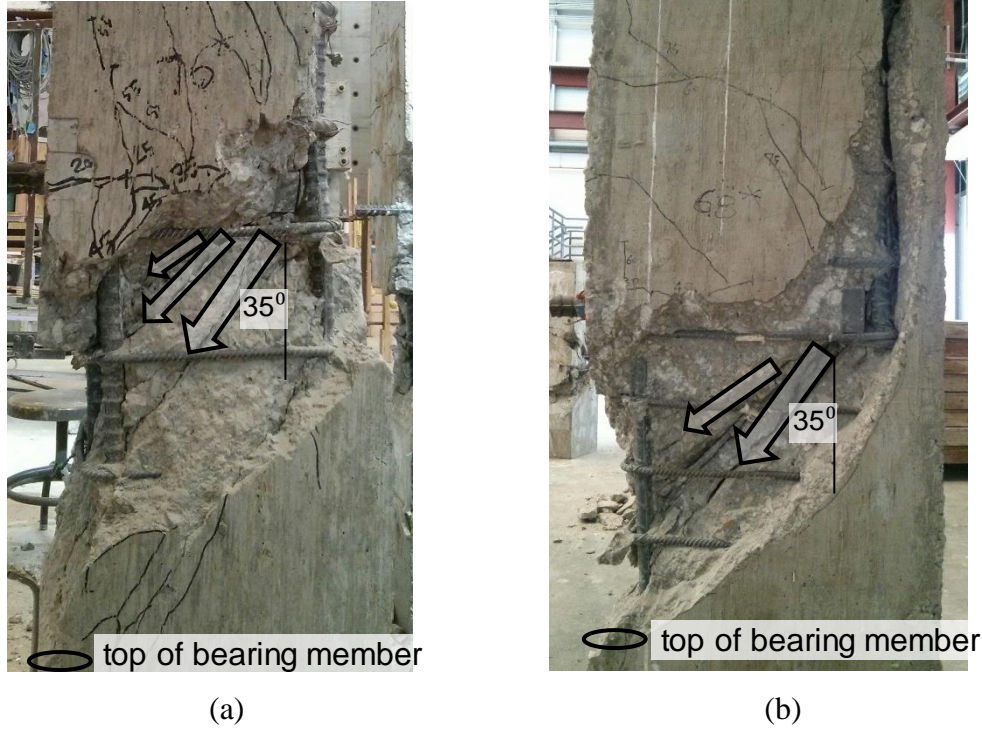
Cracks for specimens with large h_{cl}/ℓ_{eh} ratio and confining reinforcement (a) specimen 8-5-F4.1-5#3-i-2.5-3-10-DB (b) specimen (3@5.35)11-8-F3.8-6#3-i-2.5-3-14.5
